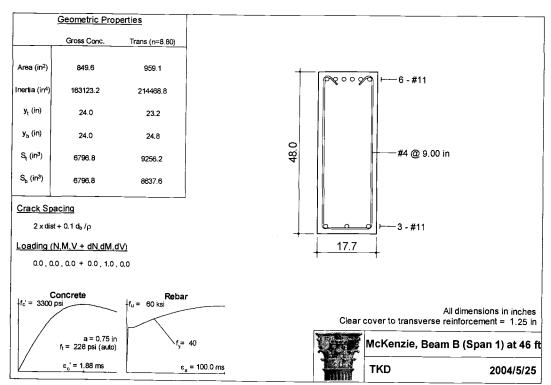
McKenzie R. Bridge; Span 1 at 46 ft. (RESPONSE 2000TM)
